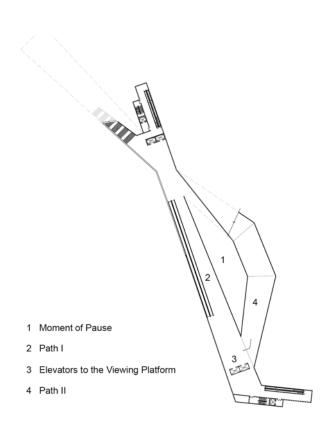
4th Floor Plan, Tunnel's Main Level Scale: 1/1500
